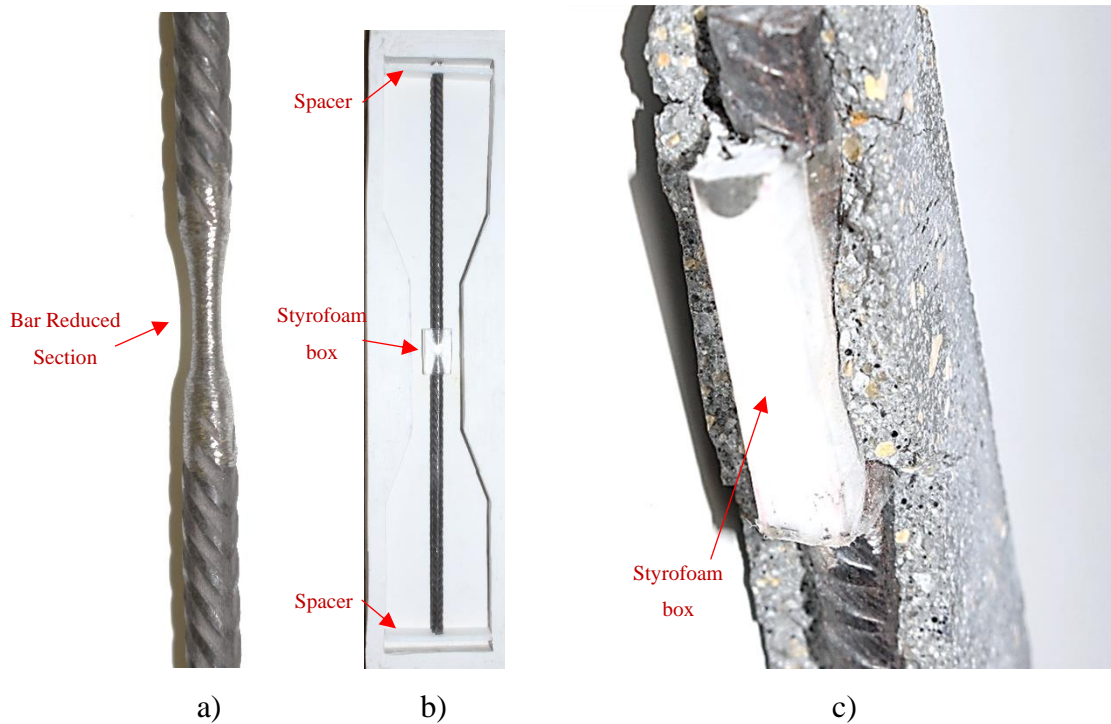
a) Steel bar with cross-section reduction to 3 mm; b) Specimen's mold; c) Inside of the concrete specimen.
